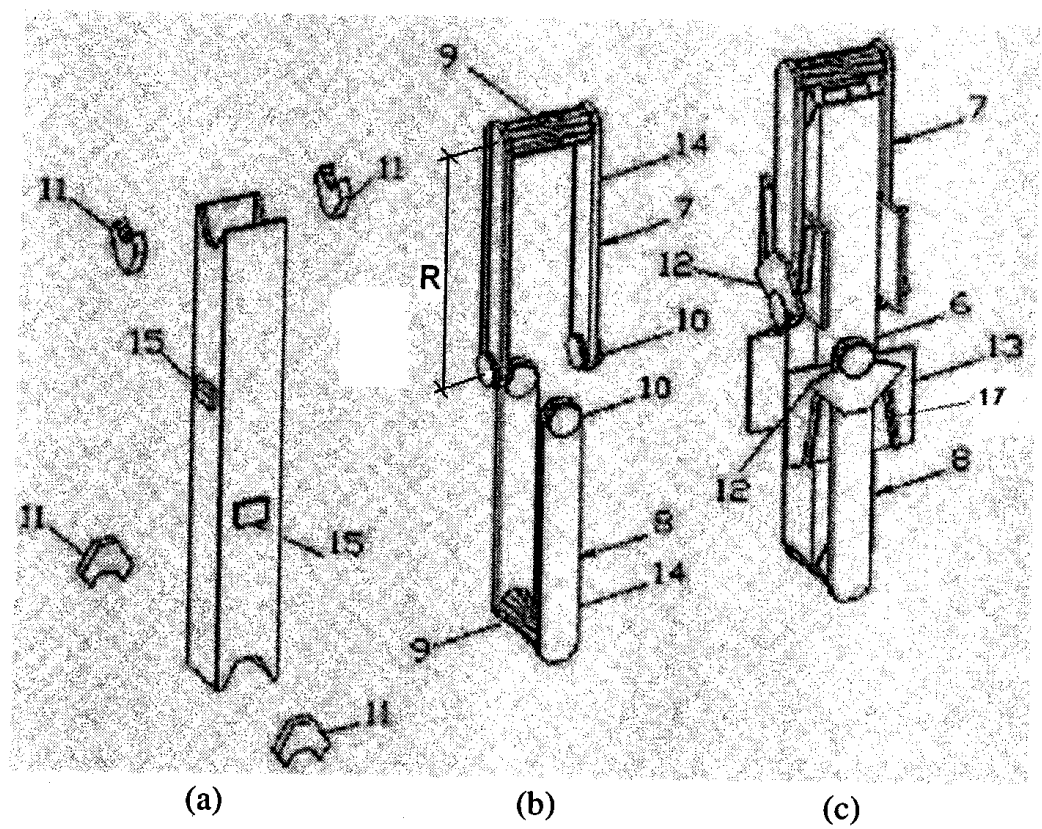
Inside SIC details (a) inside column, (b) pendular suspension bracket, (c) inside column with rigidly connected elements.
